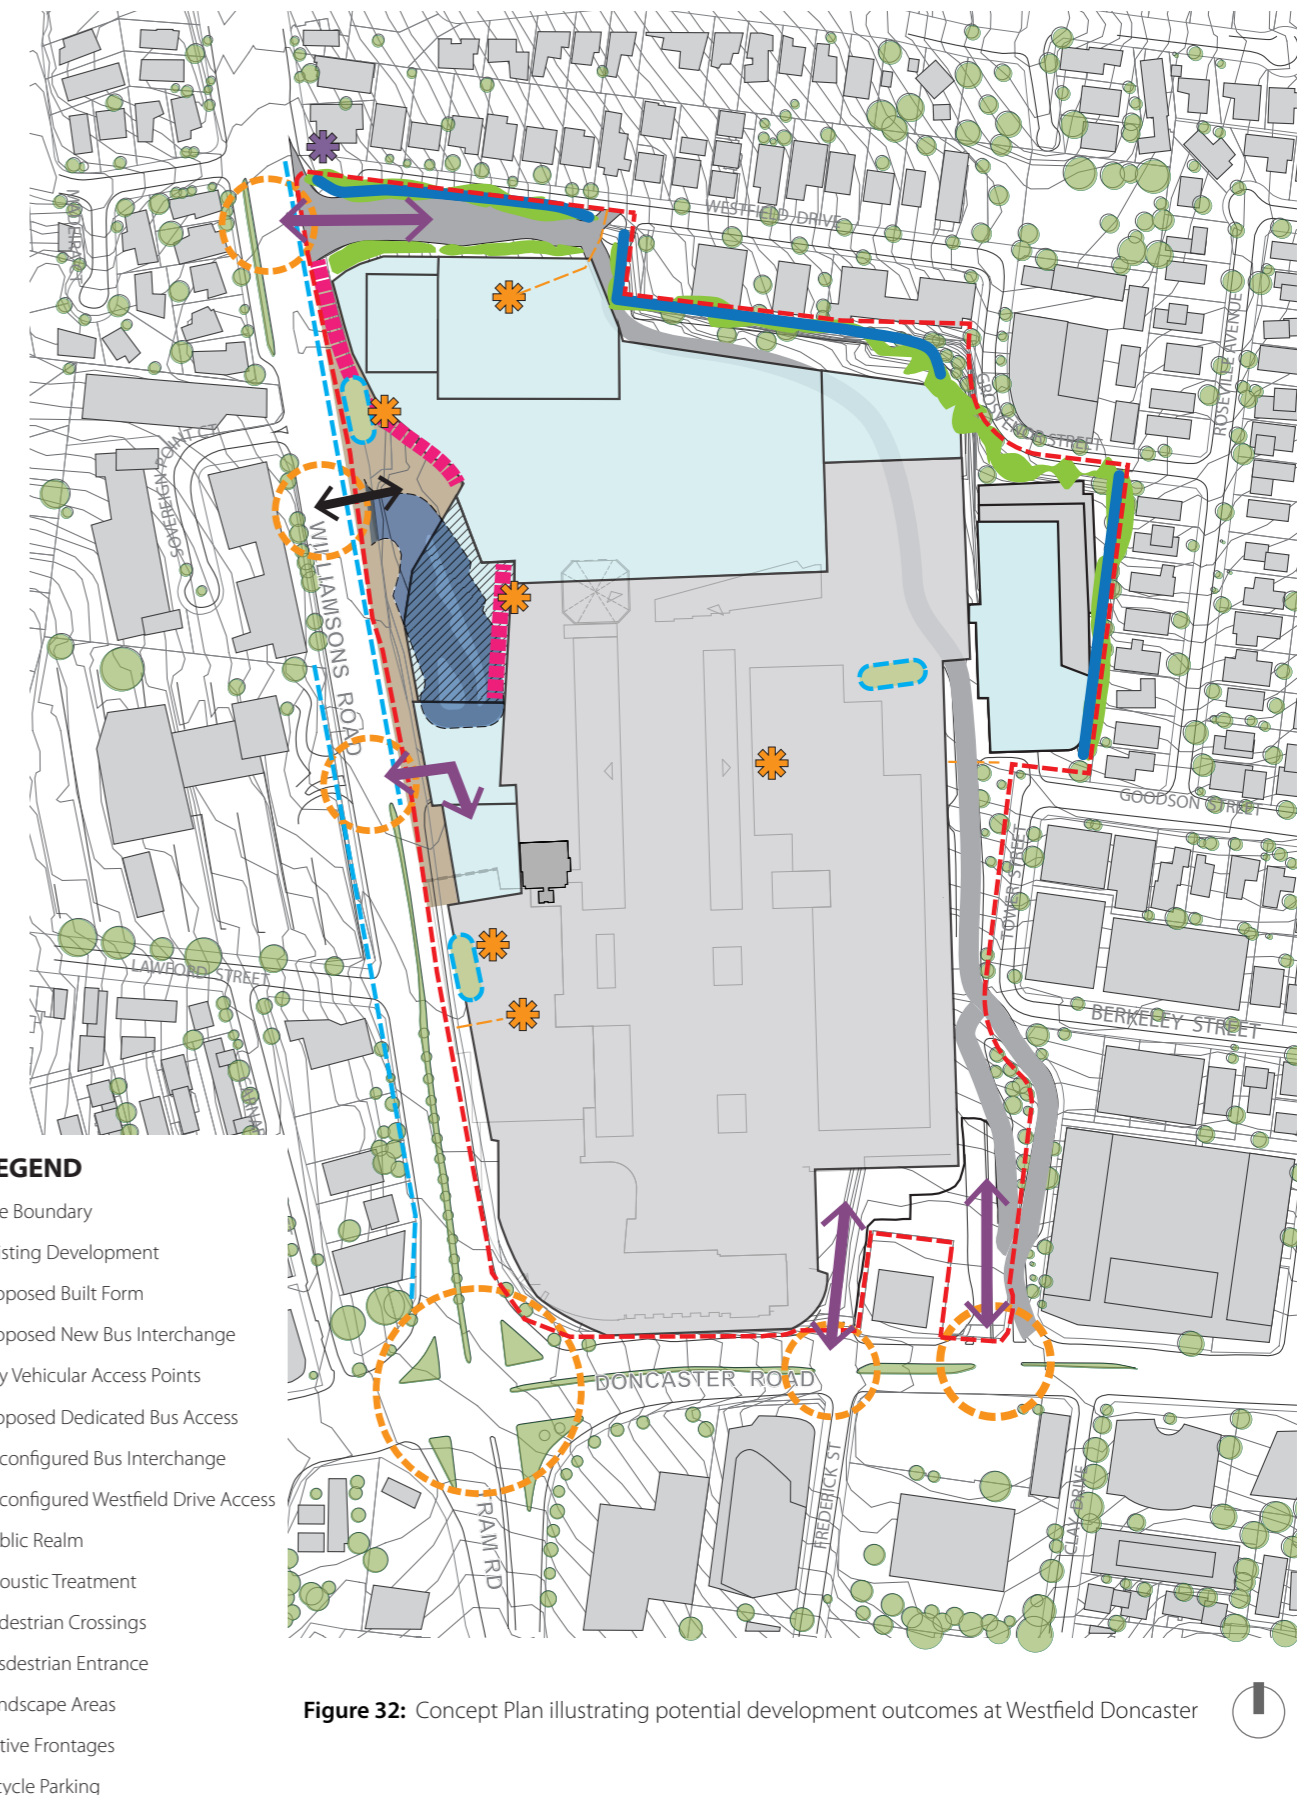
Concept Plan illustrating potential development outcomes at Westfield Doncaster
